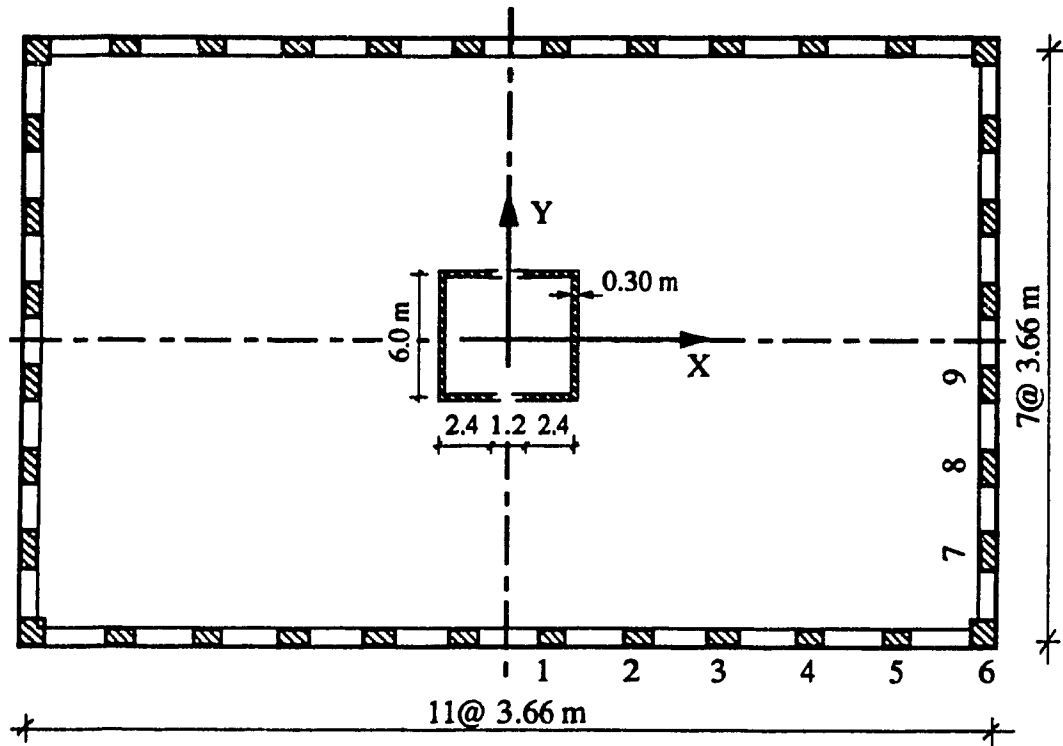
Plan of symmetric 30-story tube-in-tube structure under torsion
